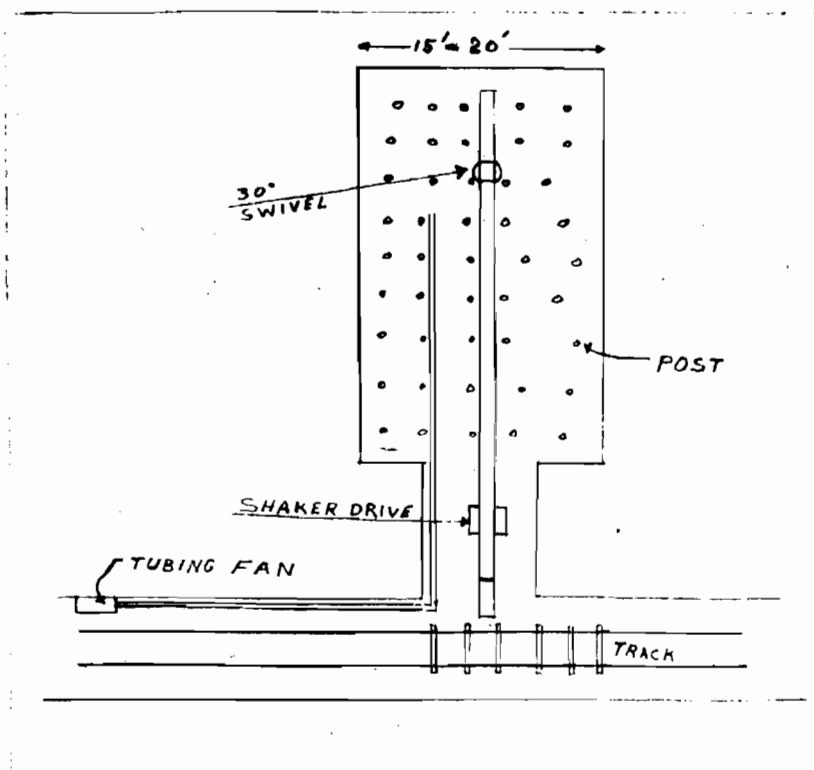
SHOWS TIMBERING AND ROOM WORK
